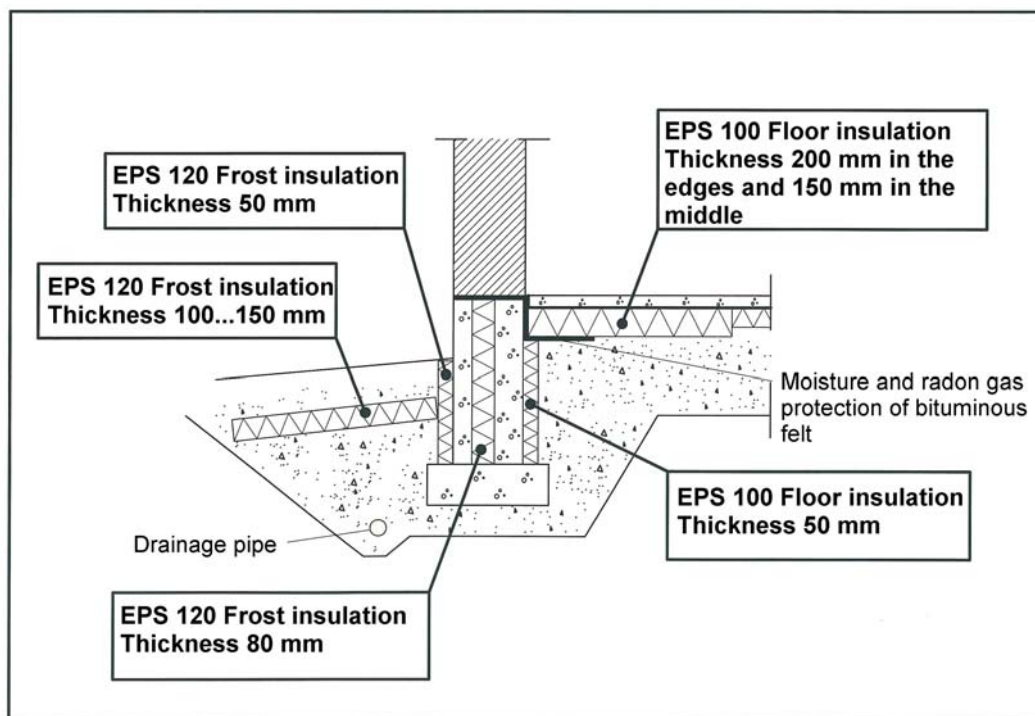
Example of how to use EPS frost and floor insulation materials in ground slab structures.
